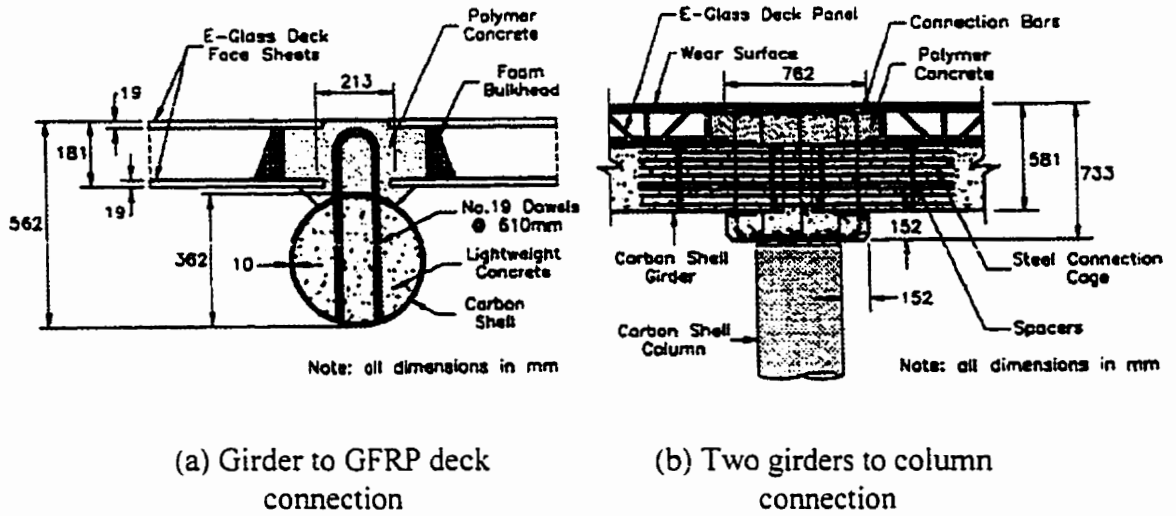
Connection details of concrete-filled carbon shell system [Seible et al 1998]
